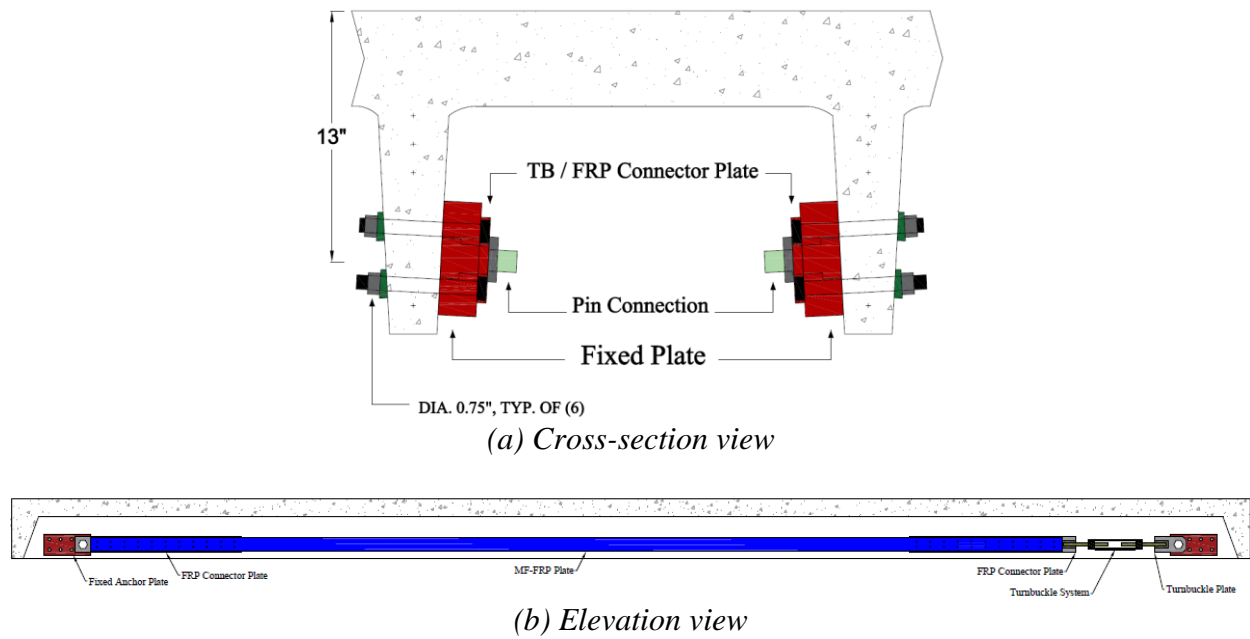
MF-FRP repair system installed on typical C-channel beam.
